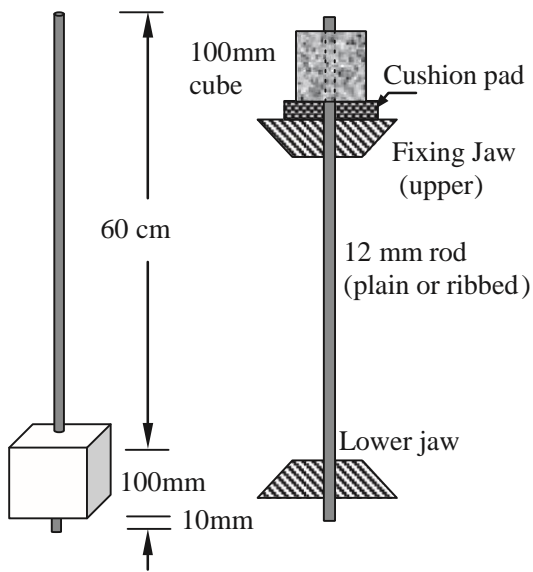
DETAILS OF SPECIMENS FOR VARIOUS TESTING
